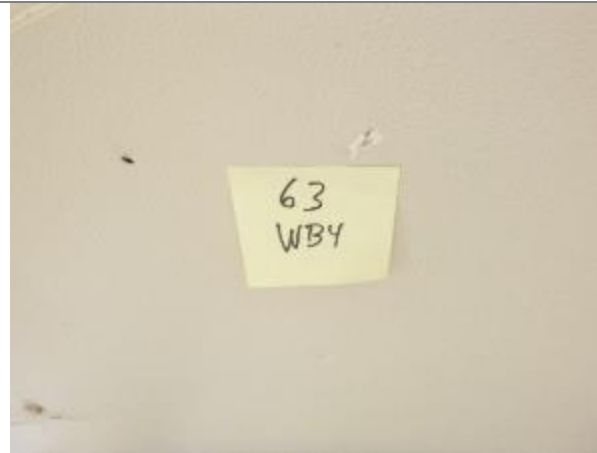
HA-63, white gypsum board ceiling with white skimcoat
